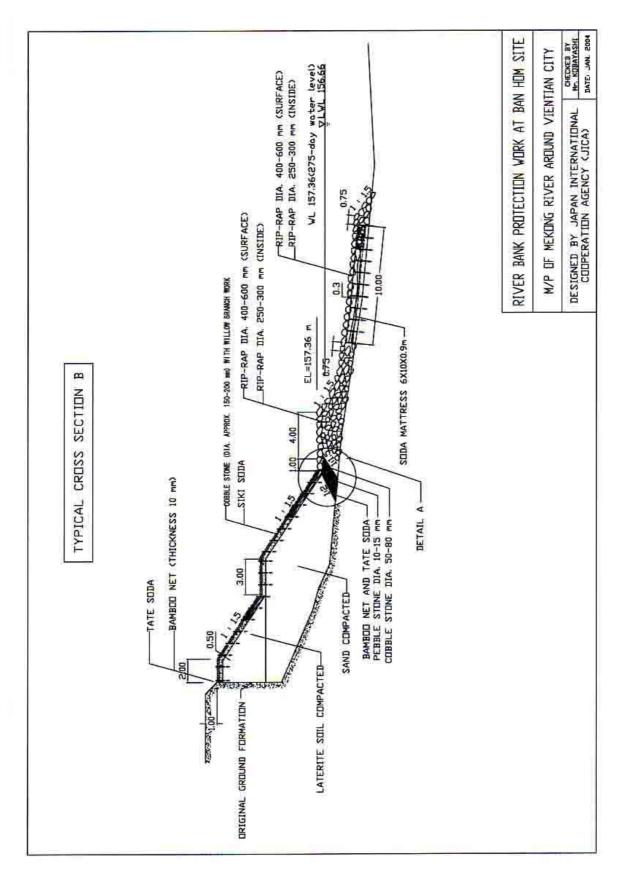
(2/2) Typical Cross Section of Riverbank Protection Work (Type B) at Ban Hom Site
